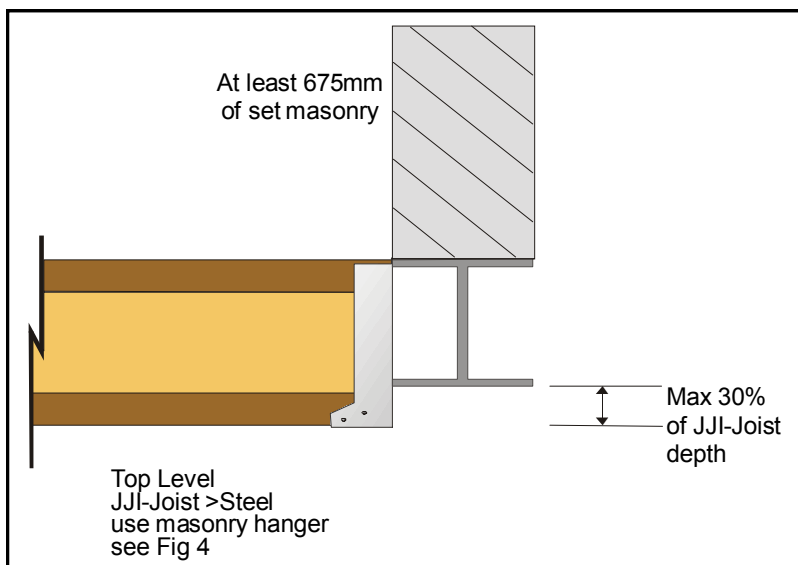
Correct JJI-Joist to steel UB connection Figure 6b. Incorrect JJI-Joist to steel UB connection
